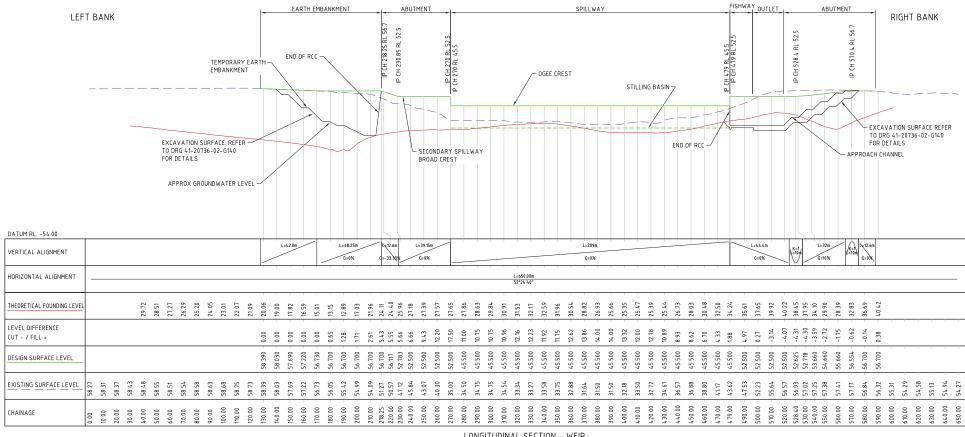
Rookwood Weir Stage 2 ogee spillway section
